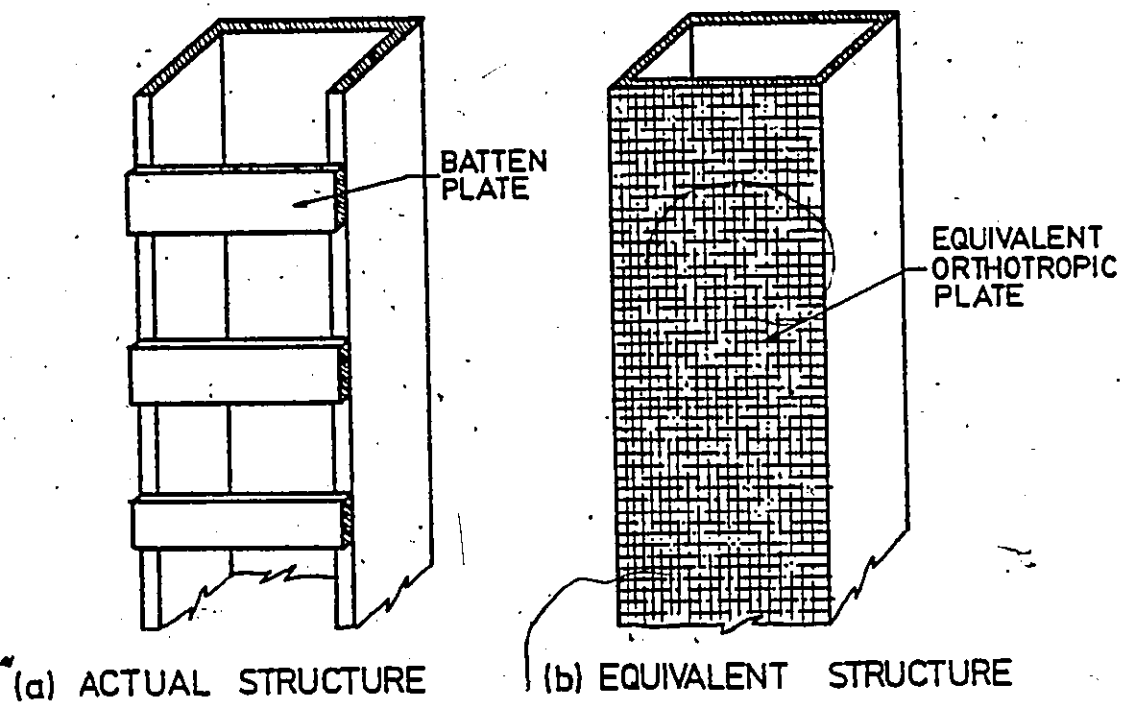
MODELLING OF BRACED THIN-WALLED ELASTIC BEAM - VLASOV [119]
